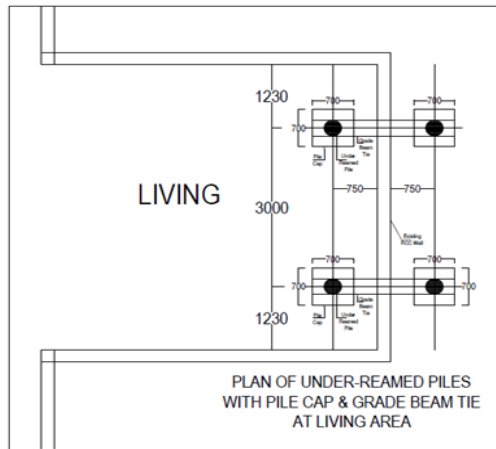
Plan of Under- Reamed piles with pile cap and grade beam tie at living area
